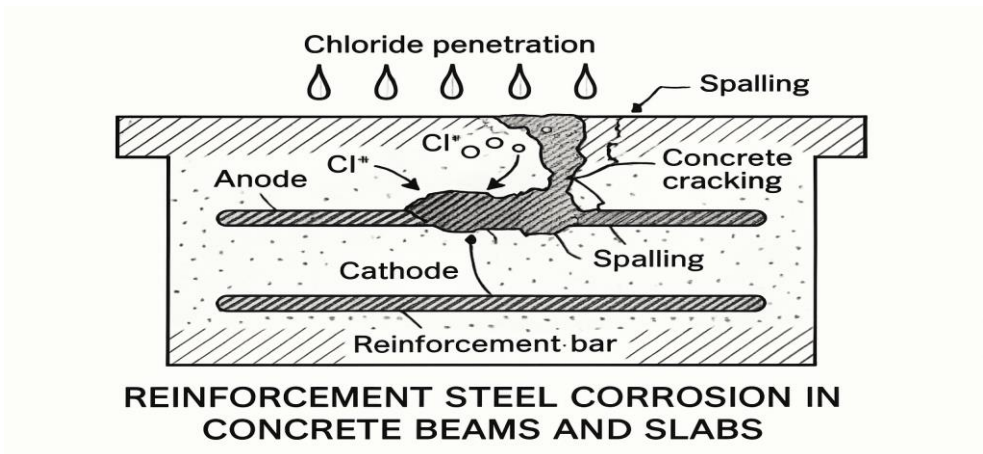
Schematic representation of reinforcement steel corrosion in concrete beams and slabs, showing chloride penetration from above and resulting concrete cracking and spalling
